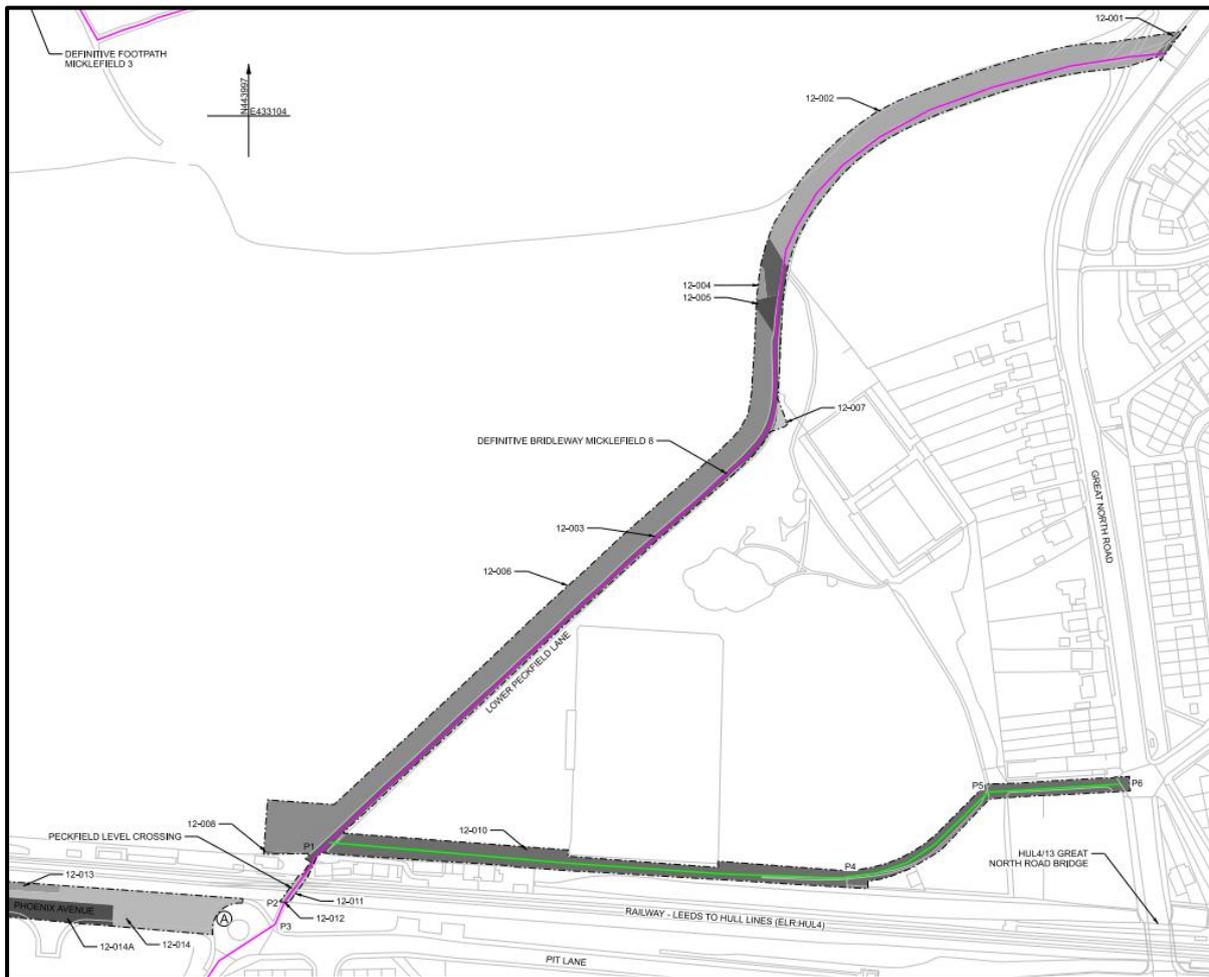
Extract of Works and Land Plan Order Sheet 12 (NR09)
